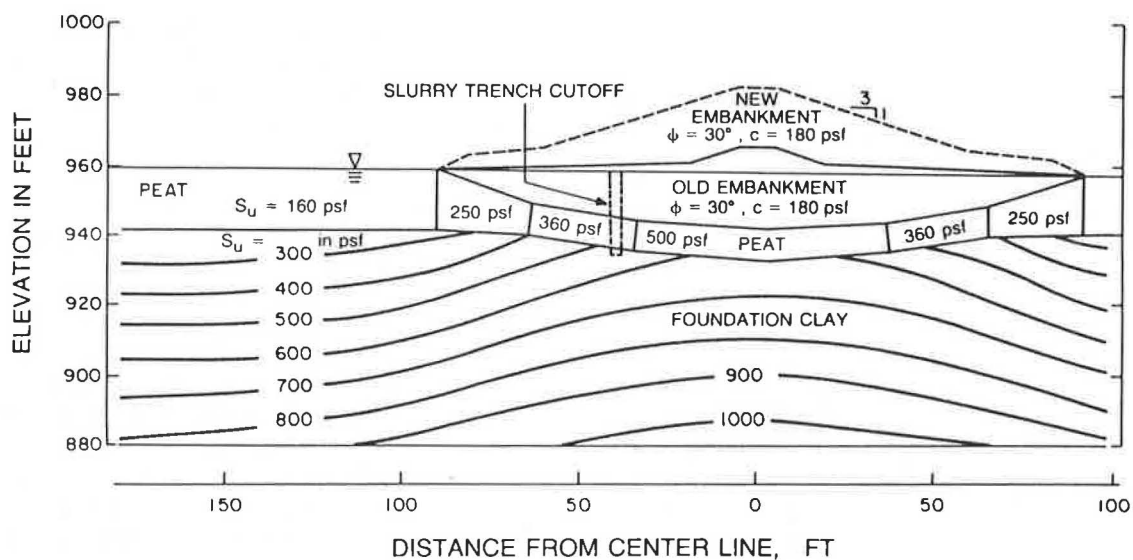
Typical cross section and undrained shear strengths [after Collins et al. (1)].
